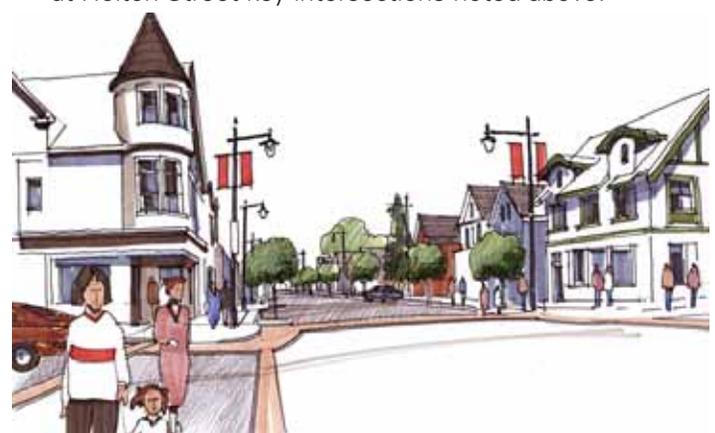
Center Street and Holton - Looking south from the east side of the street
